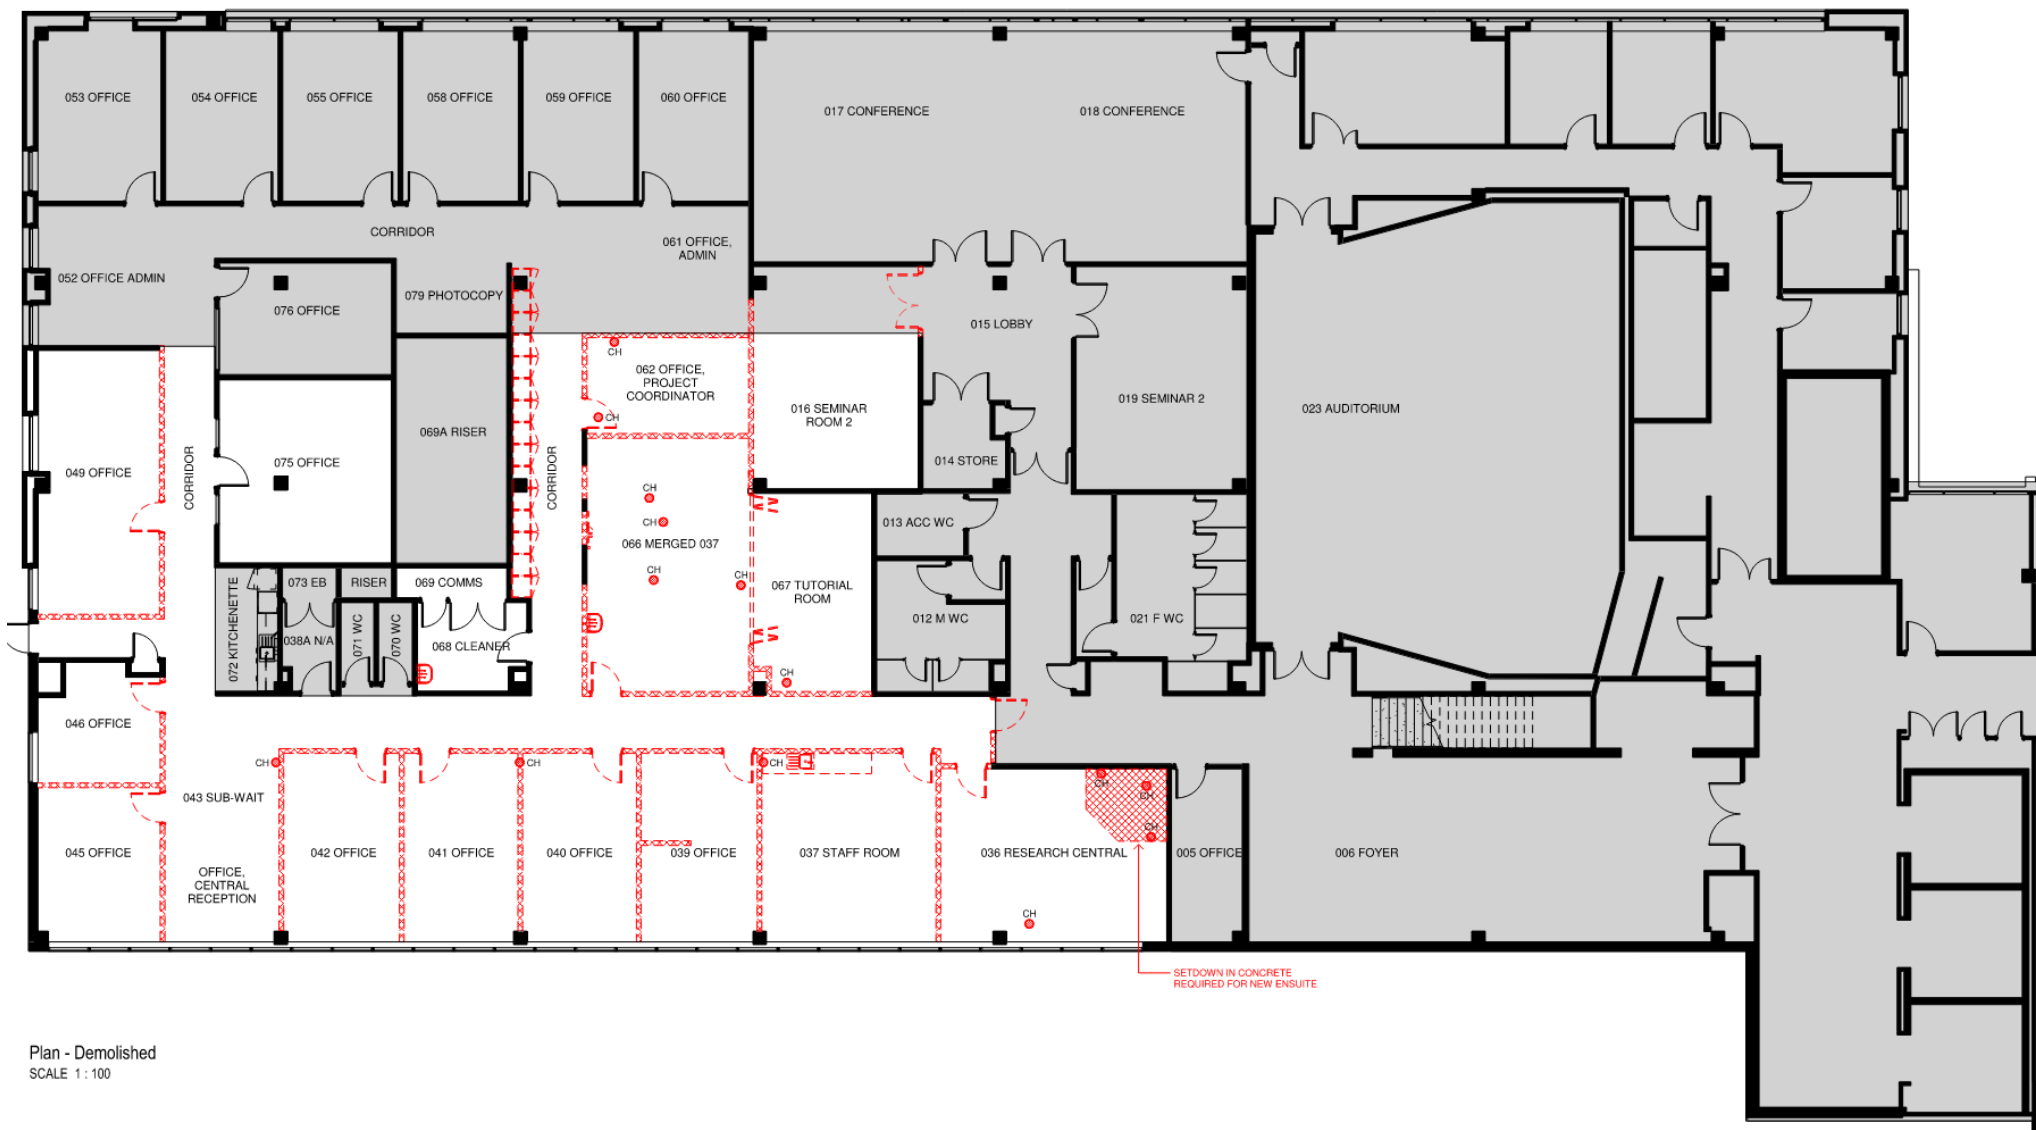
Medical Ambulatory Care (MAC) Unit Demolition Floor Plan
